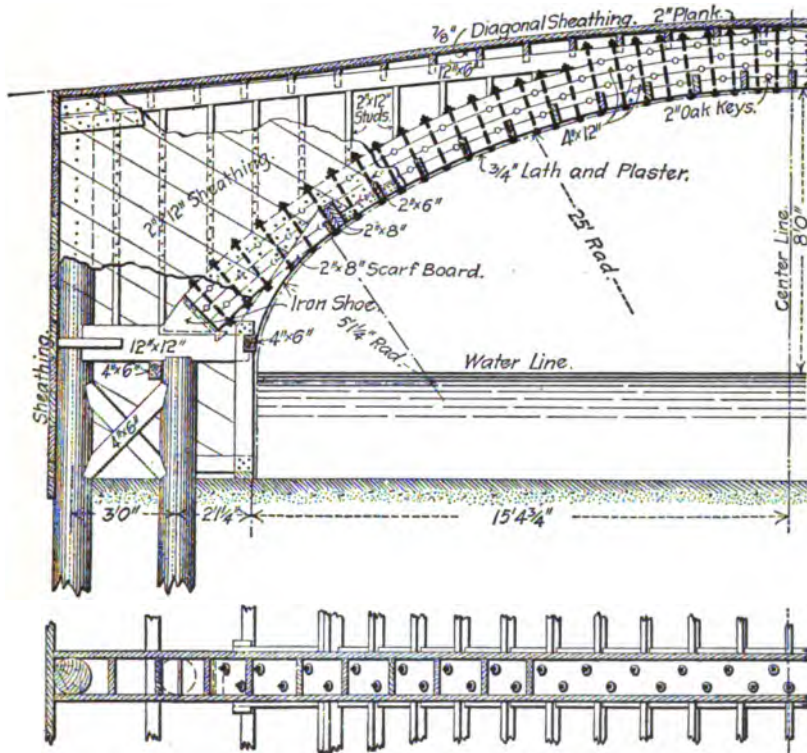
Wooden Bridge Construction, Pan-American Exposition.
